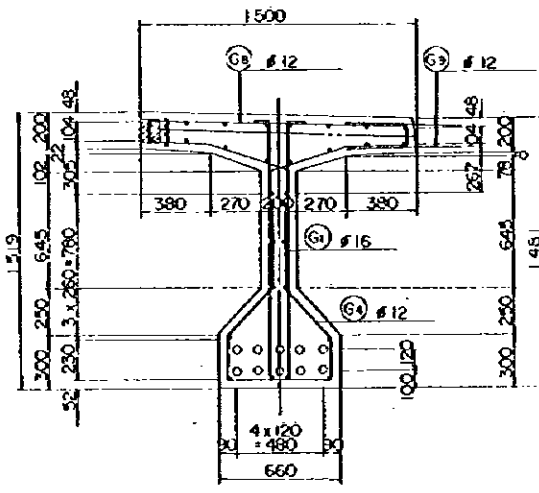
DETAIL OF A' SCALE 1:20 SECTION D SCALE 1:30 SECTION E SCALE 1:30
